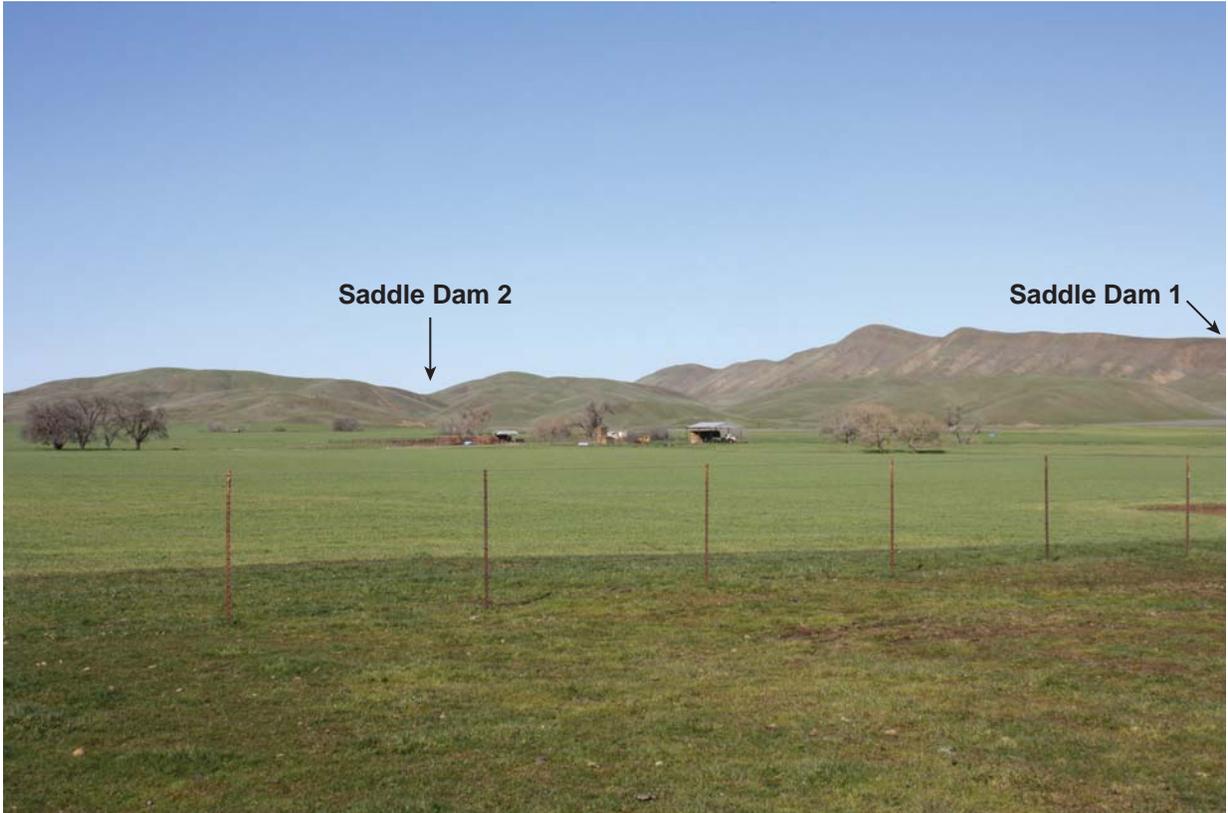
Looking north from Peterson Road toward Saddle Dams 1 and 2 locations from inside of the inundation area. Saddle Dam 1 would be located immediately adjacent to Logan Ridge on the right side of the photo. Saddle Dam 2 would be located to the left of center of the photo.
